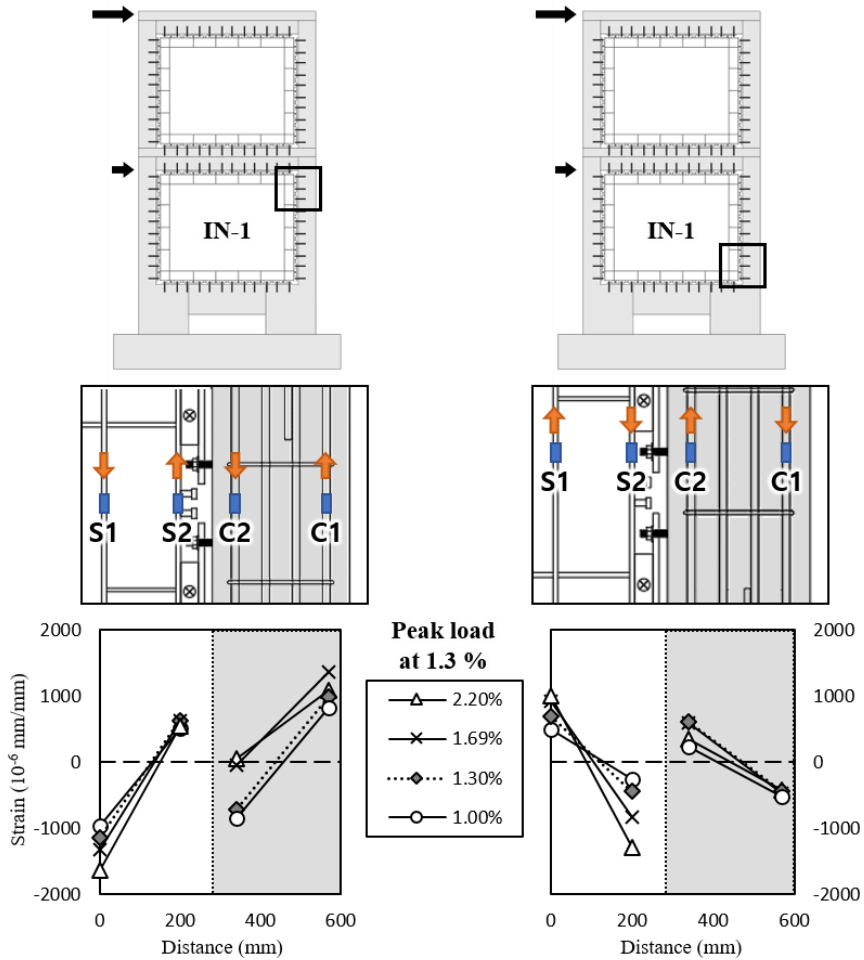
Strain distributions of steel flanges and vertical bars in the 1<sup>st</sup>-story column of specimen IN-1
